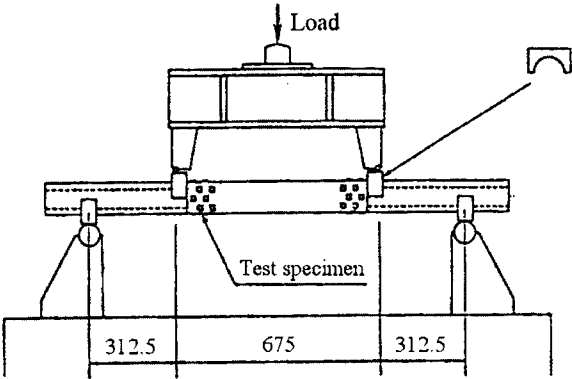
Apparatus for Pure Bending Test of Small Scale Test Specimen
